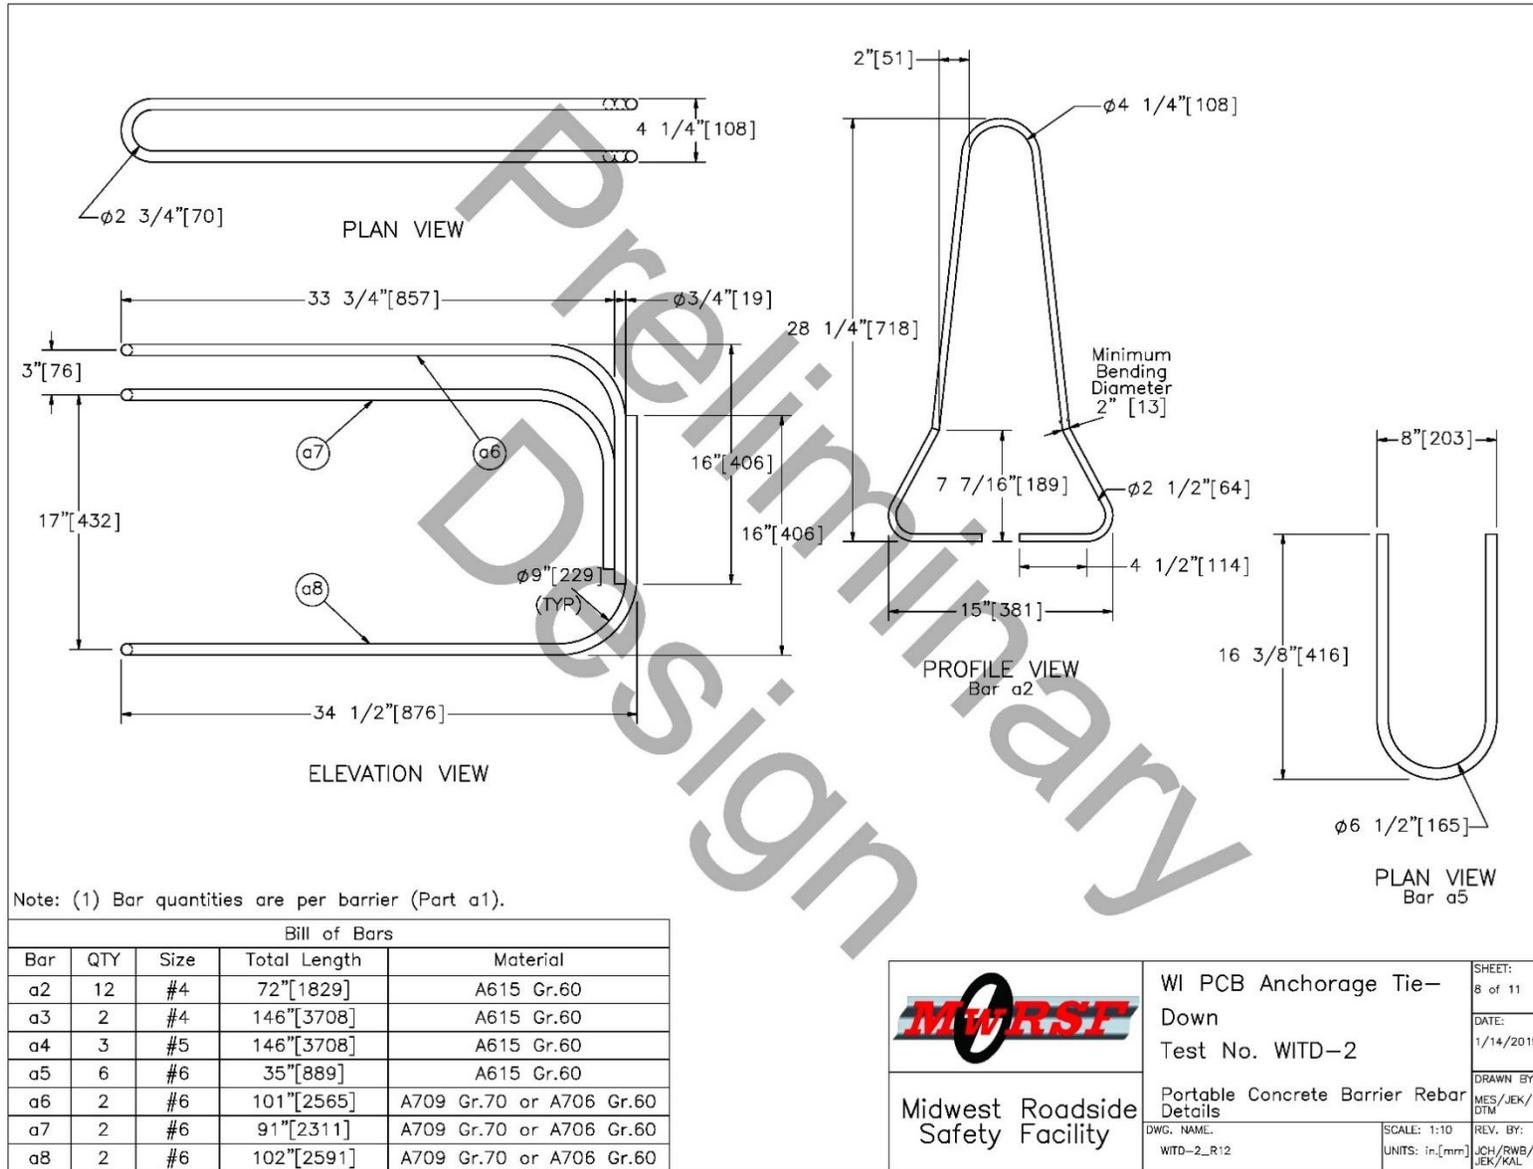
Portable Concrete Barrier Rebar Details, Test No. WITD-2
